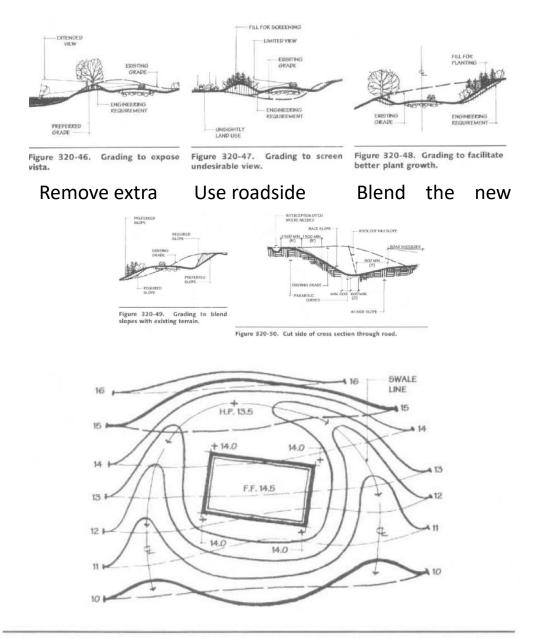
Swales to divert water around building. Note that the channel widens and the slope diminishes as the swale approaches existing grade.
